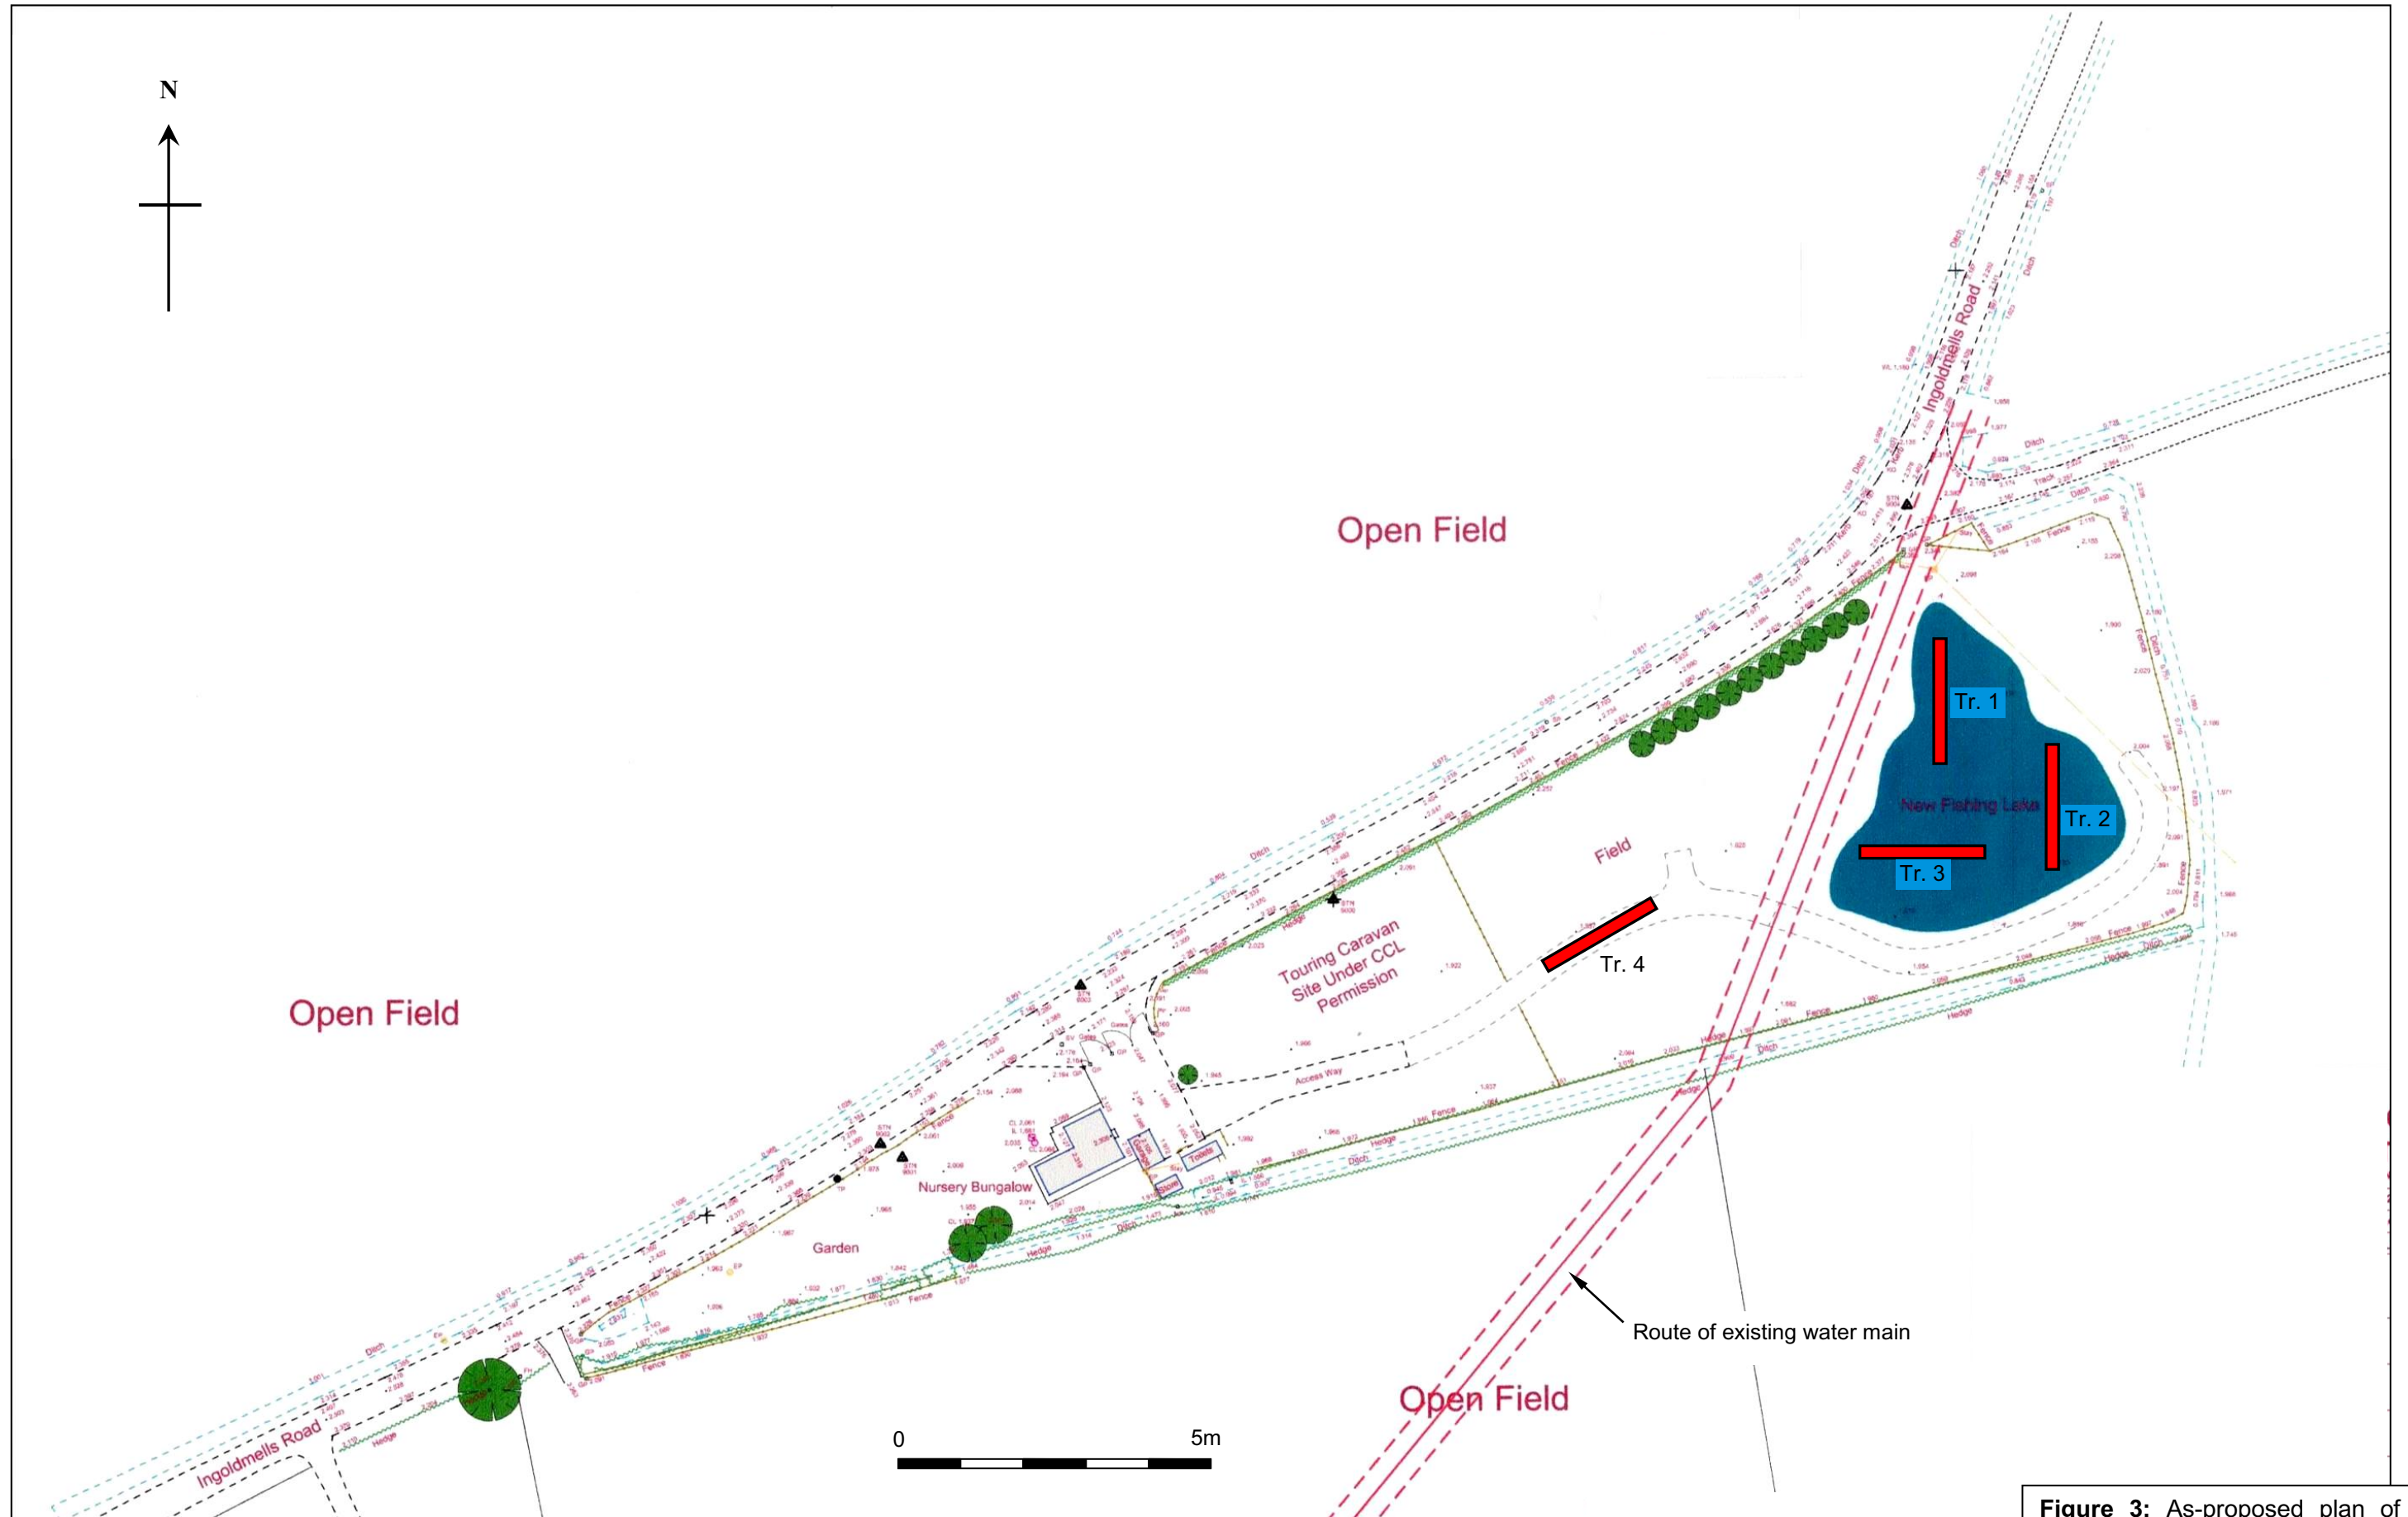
As-proposed plan of the site at scale 1:1000, showing the proposed trench locations. Plan supplied by client.
